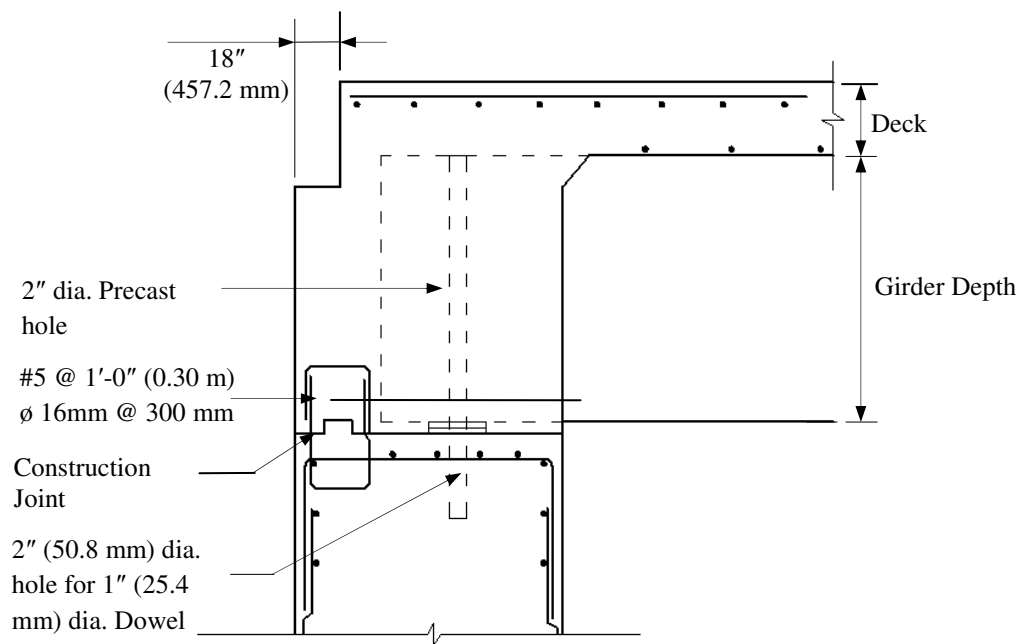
Typical Detail of NYSDOT Standard Abutment-Backwall Connection
